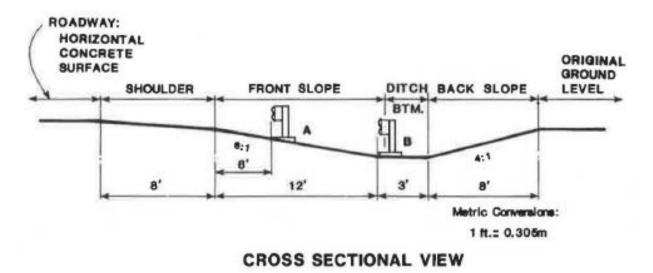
G4(1S) Installation on Slopes for Test Nos. 3659-1 through 3659-4 [6]
